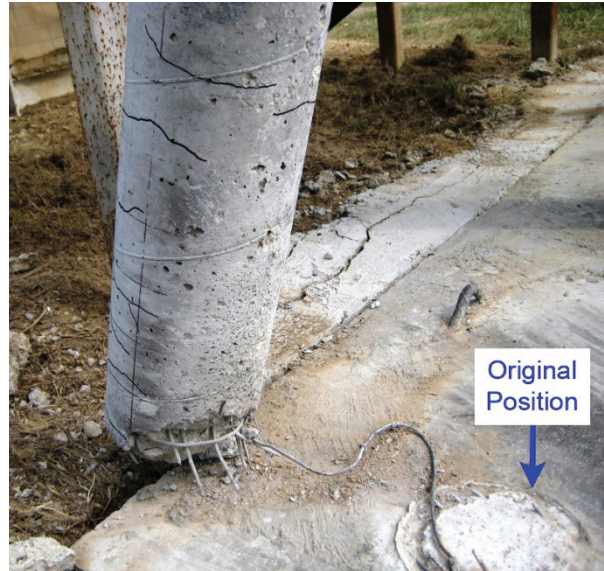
Fracture of Longitudinal Steel Bars at Footing (Test 1)
